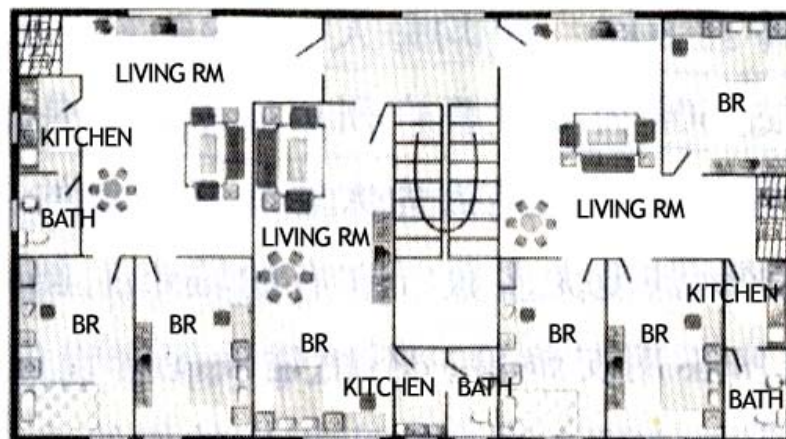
Typical Floor Plan of Urban Village Apartments
